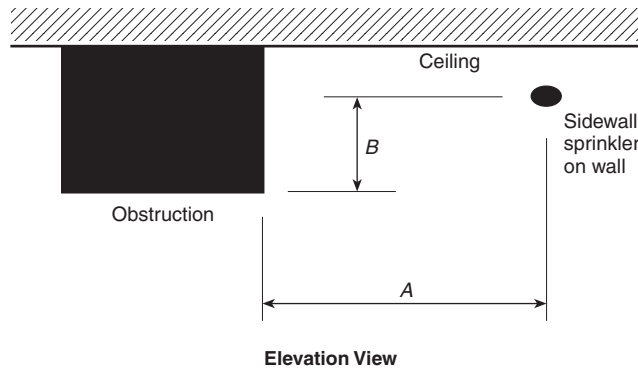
(b) Positioning of Sprinkler to Avoid Obstruction Along Wall (Residential Sidewall Sprinklers).
